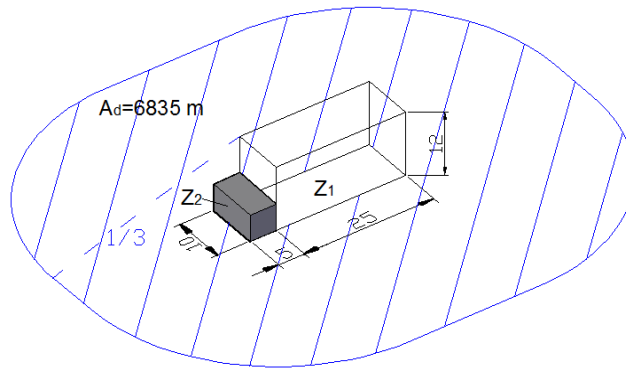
Main substation at wind power plant: Z_1 is the zone outside the building; Z_2 is the zone inside the building.
